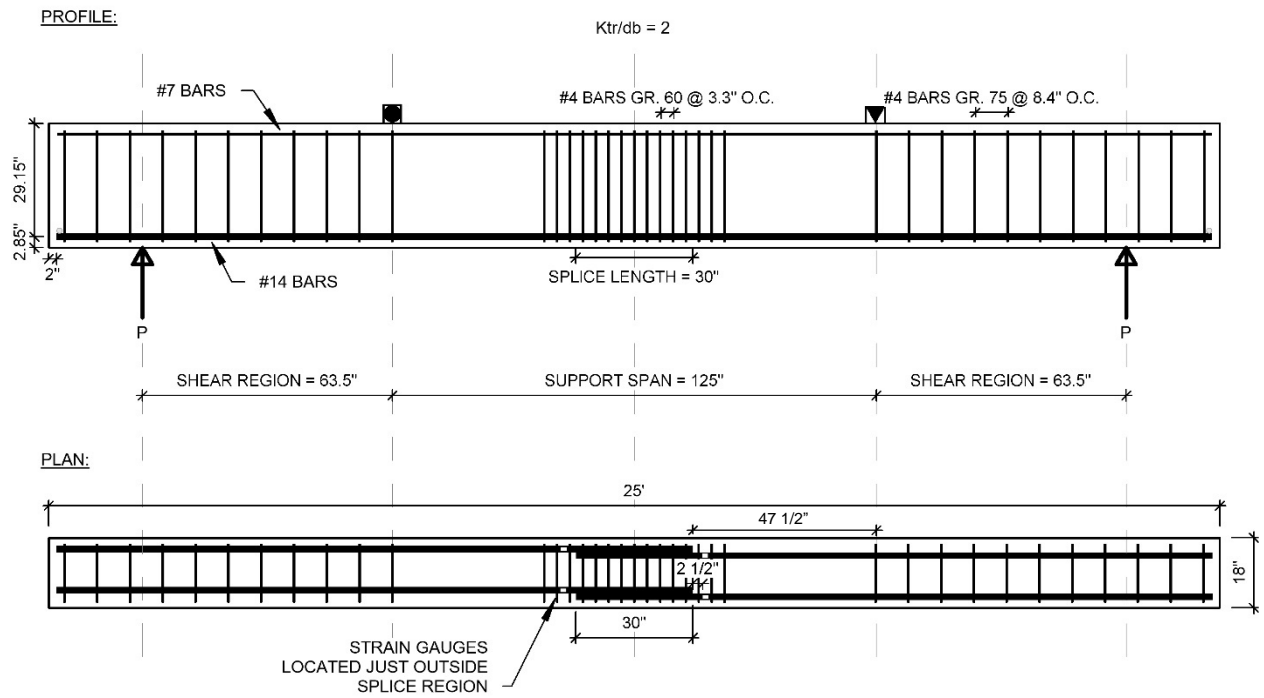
Profile and plan of 14-c (1 in. = 25.4 mm)
